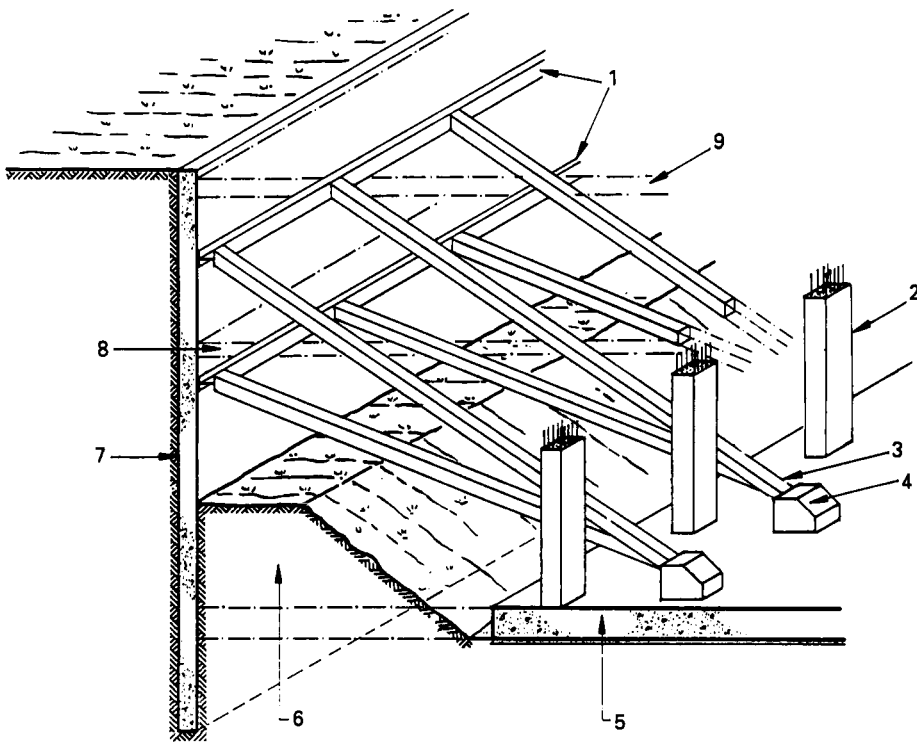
1 Walings; 2 struts; 3 support in temporary berm; 4 temporary embedded wall; 5 retaining wall – first element of permanent structure
